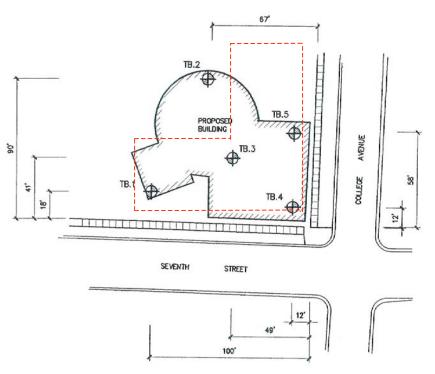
This is a plan view of the Five Test Boring Locations Note: The layout of the building here was the proposed shape. The actual building takes on an L-shape as can be seen later in Figure 1.8
